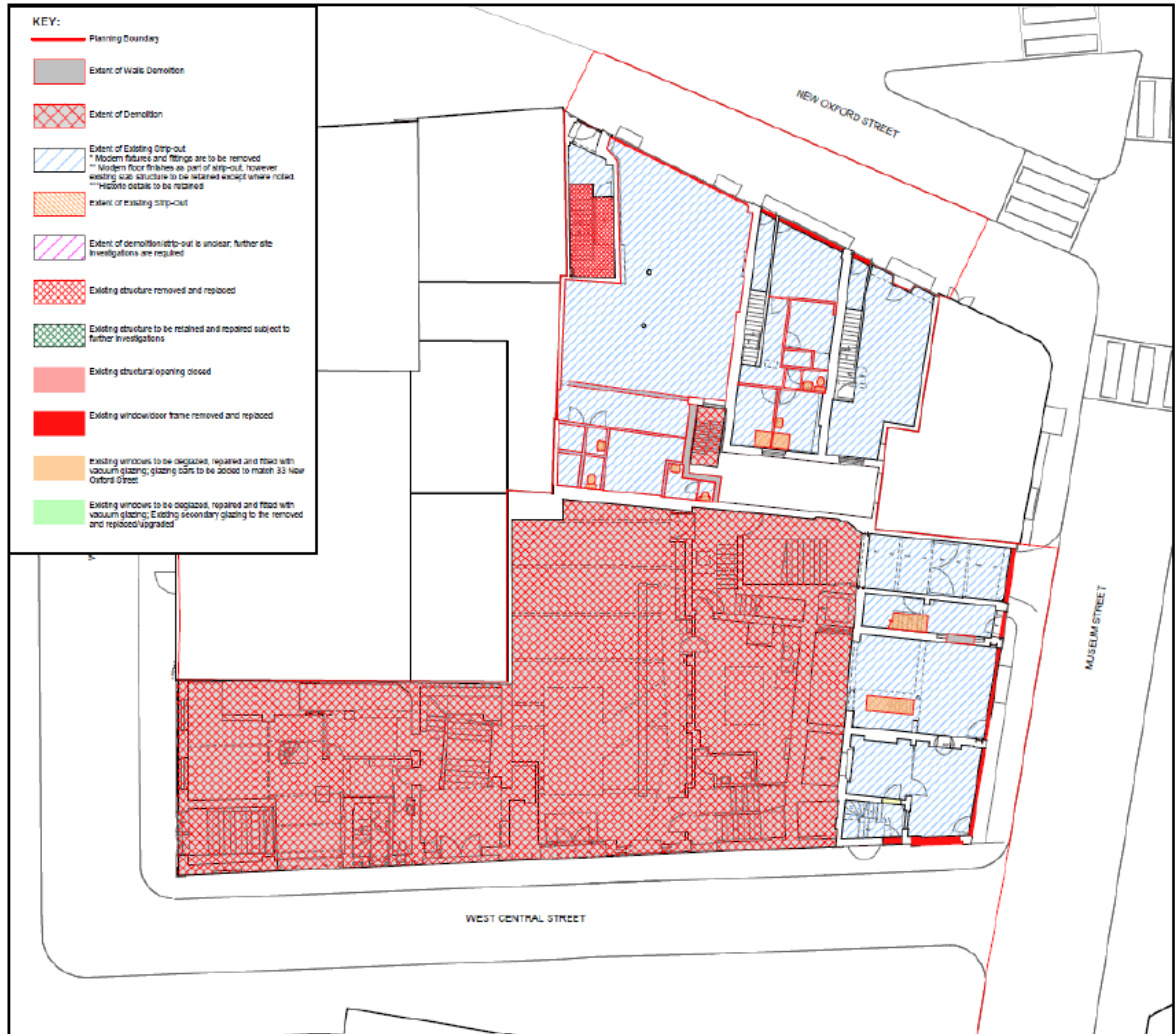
Summary overview of strip out and demolition works at West Central Street (Ground floor)
